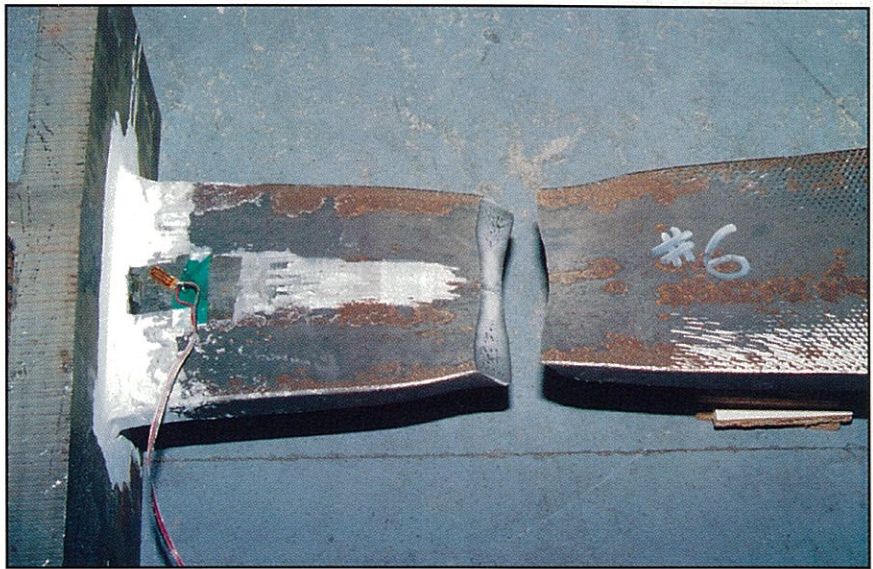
(top) Ductile beam plate fracture in E7018 welded test specimen
